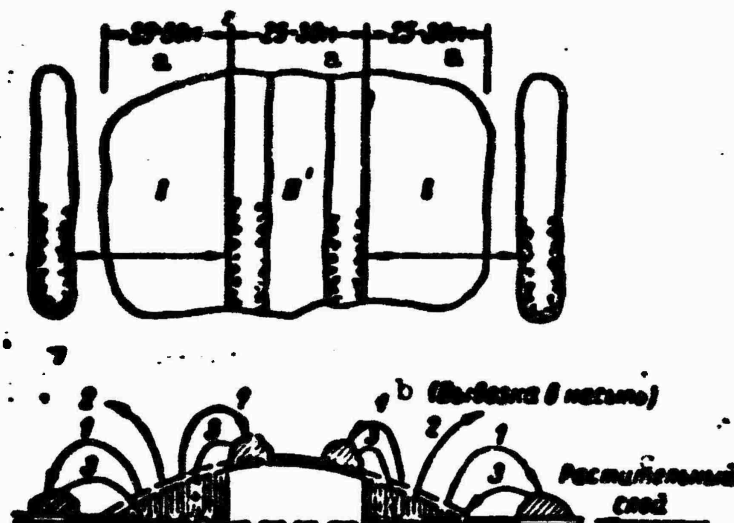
Scheme for removing and restoring the topsoil layer when making a cut, in alternating strips. a) Meters; b) hauling away to a fill); c) topsoil layer
